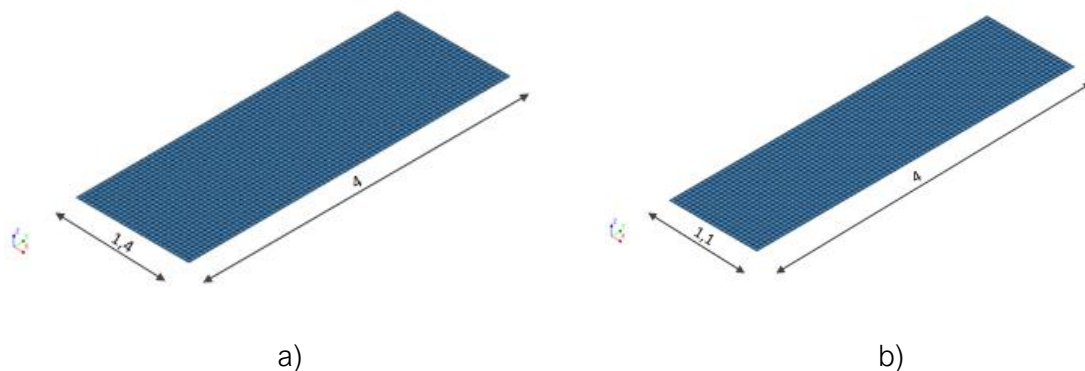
2D equivalent shell model: a) floor model with steel beams; b) floor model with timber beams (dimensions in metres).
